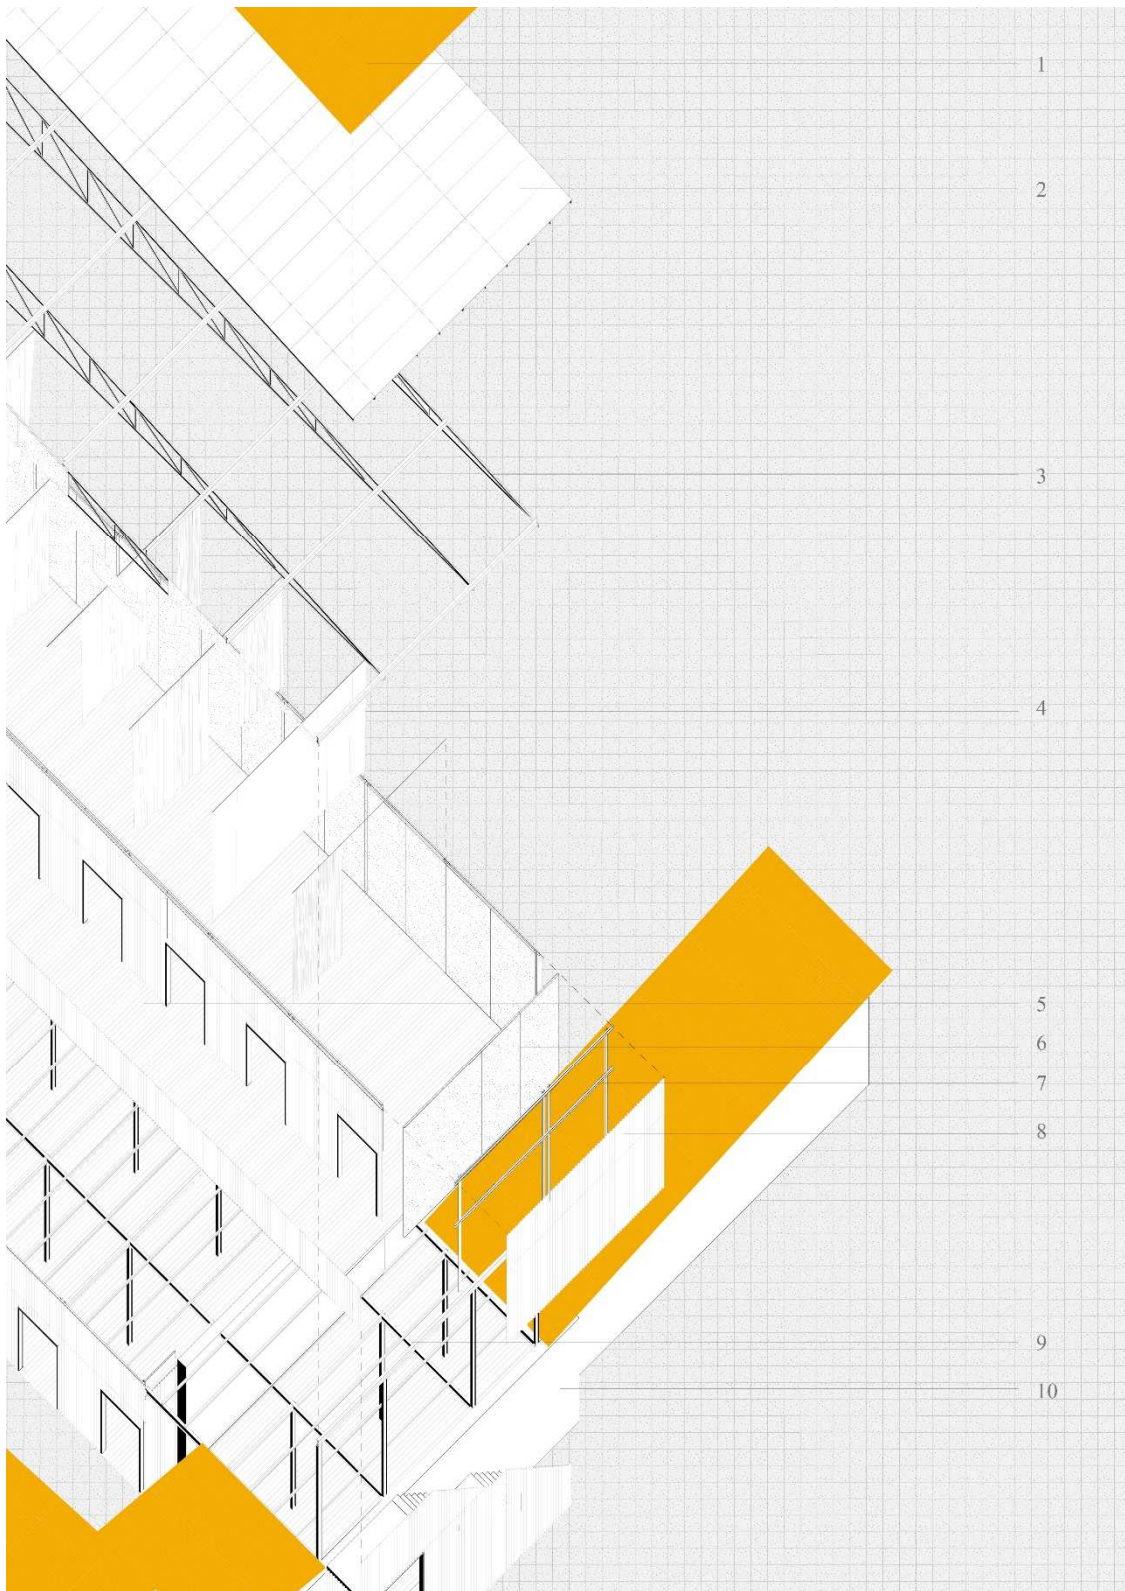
Open school extension*, 1) Roof panels, 2) Roof insulation, 3) Truss beams, 4) Internal curtain partitions, 5) Public walkway, 6) Transparent windows, 7) Curtain wall structure, 8) Perforated panels, 9) Steel structure, 10) Existing walls, Marco Giribaldo
